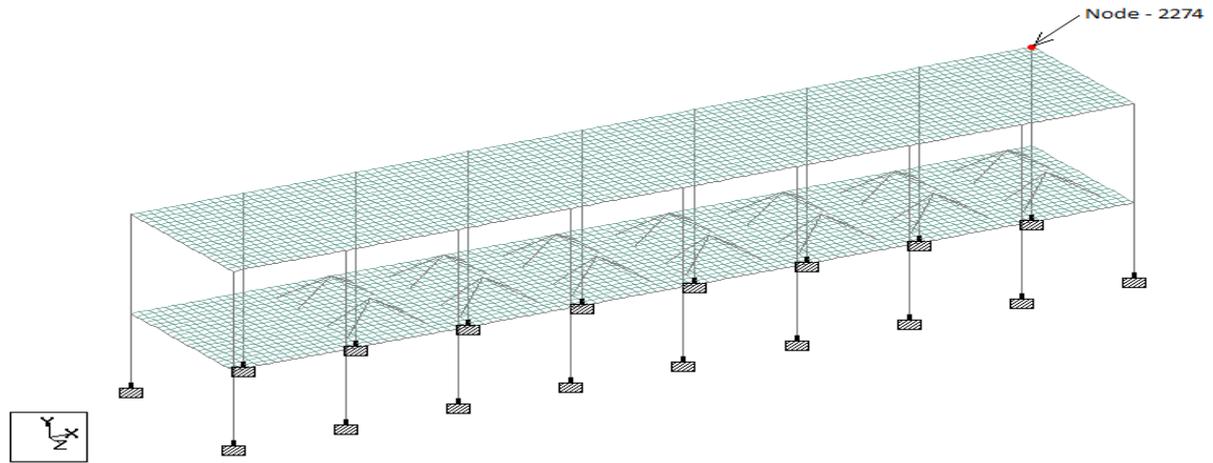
D View of a Building Structure Model for Looms Industry in STAAD.Pro
